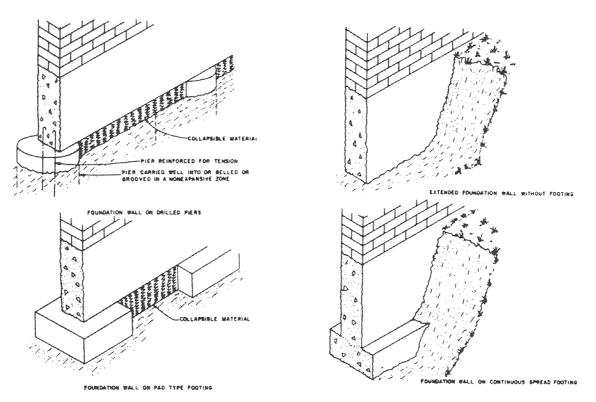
Typical foundations in use in Boulder County (from Holtz and Hart, 1978).
